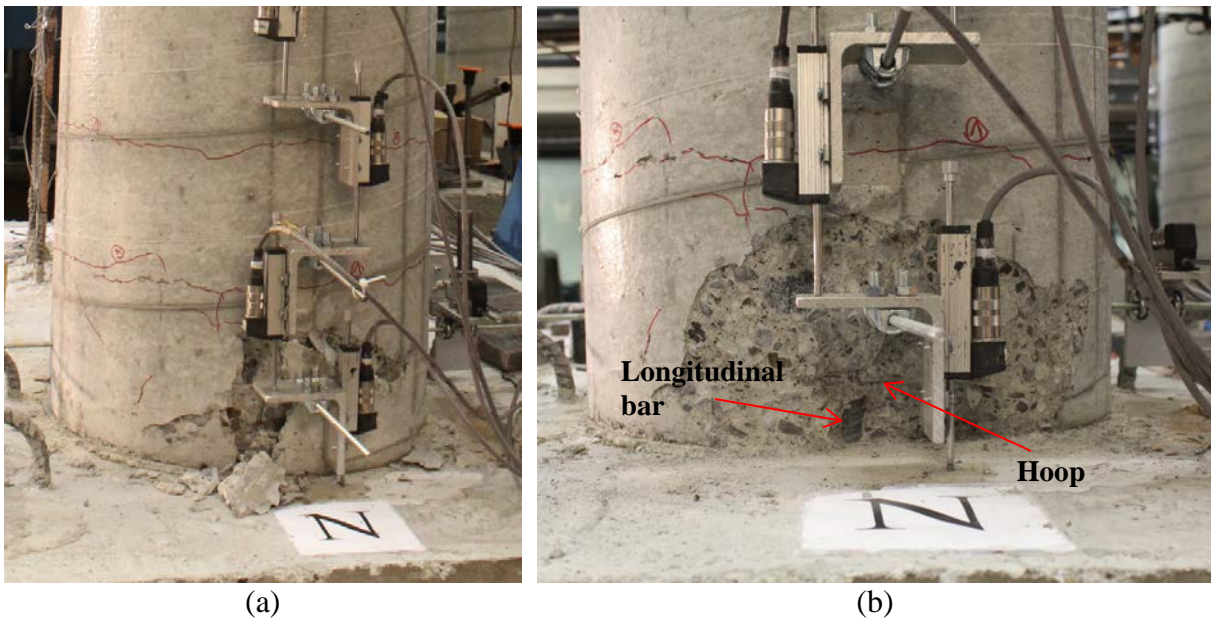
Damage in Column 2 for 1.57 x Curico X. (a) Horizontal cracks and spalling of concrete (b) Hoop and Longitudinal bar visible
